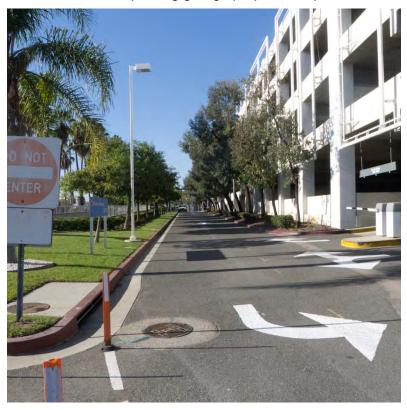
Facing southwest- View of parking garage and street (expansion area).
